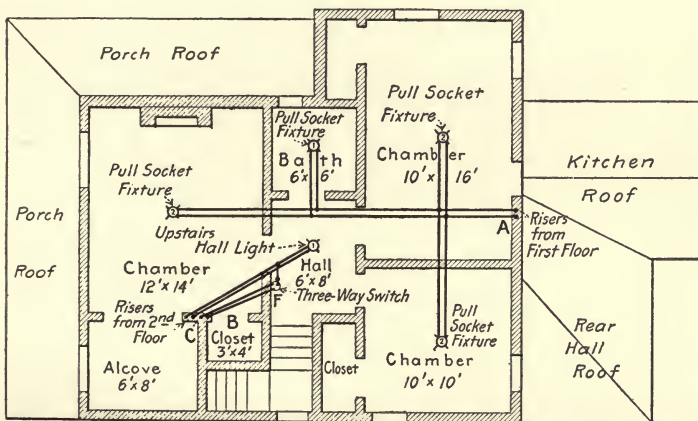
Floor plan of second story and also wiring in attic and in second story partitions.
